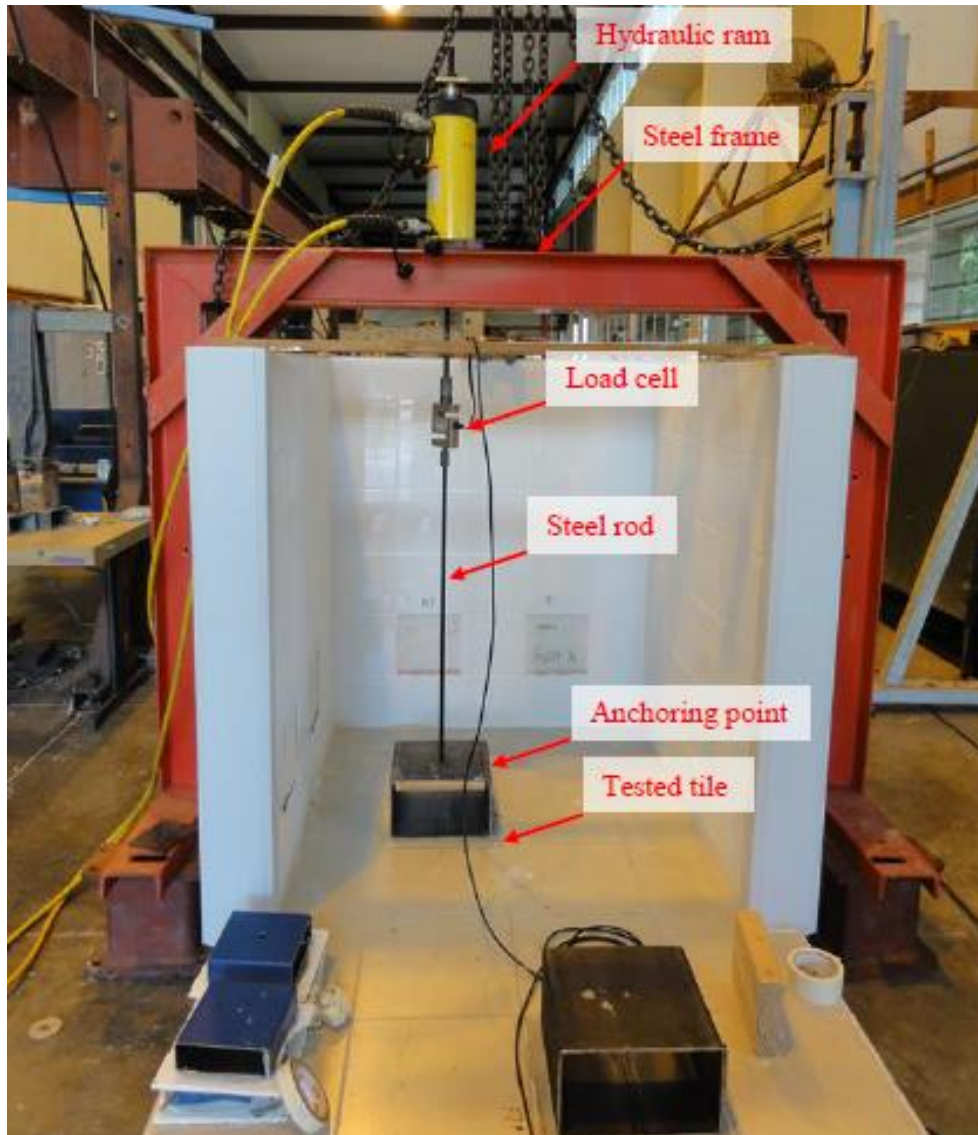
FLOOR TILE HYDRAULIC TEST SET-UP
